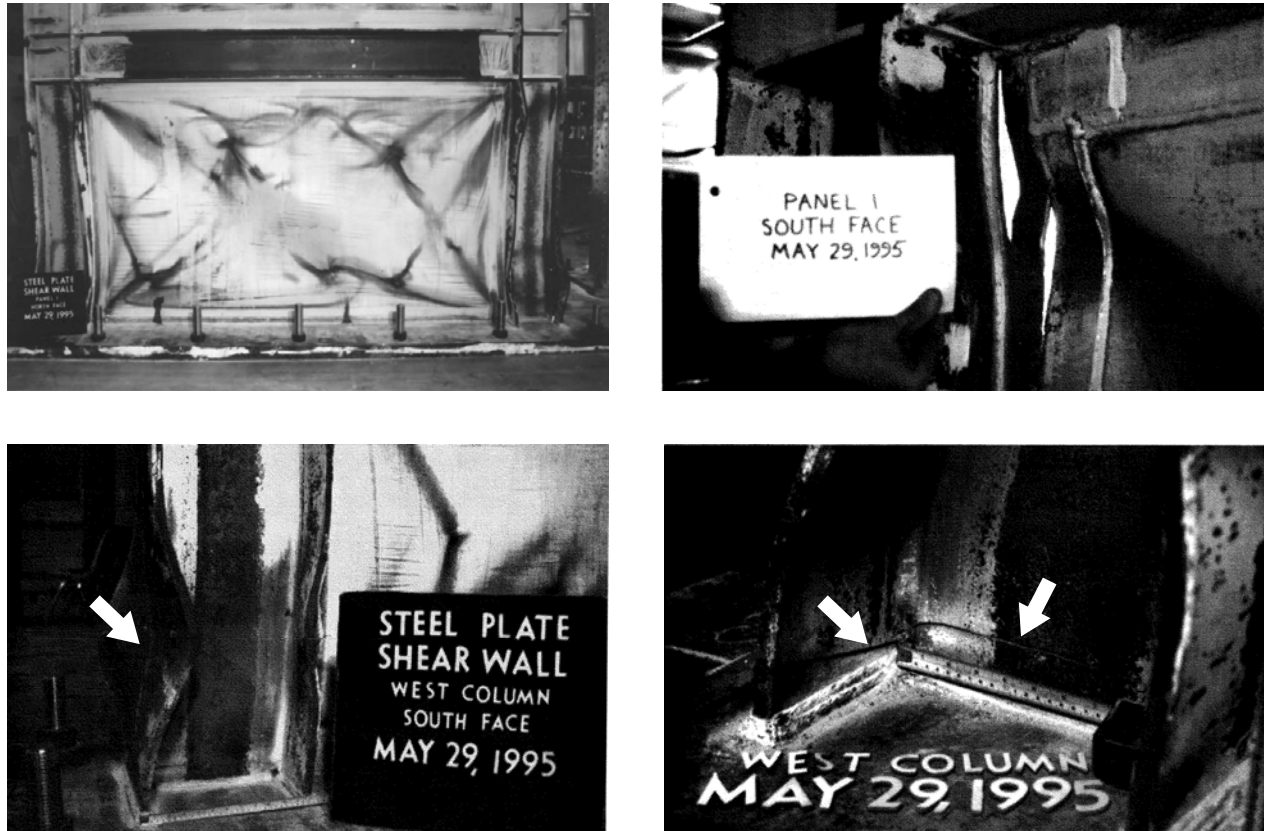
Failure Modes in Four-Story SPSW Specimen: (a) Damage at the First Story Level (Courtesy of Driver R. G.); (b) Web Tearing at the Corner of Panel (Driver *et al.* 1997); (c) VBE Flange Local Buckling; (d) Fracture of VBE at the Base (Driver *et al.* 1997)
